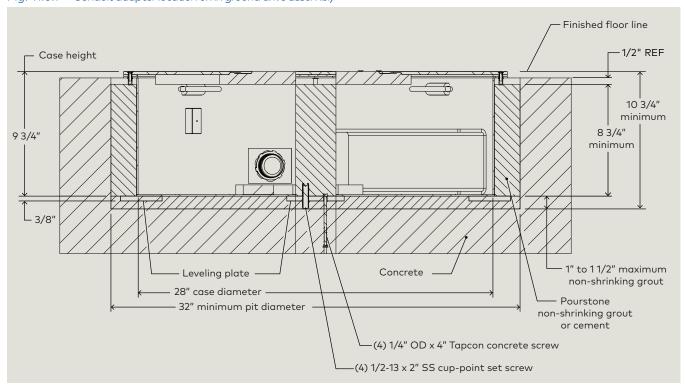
In-ground drive assembly flexible conduit adapter
